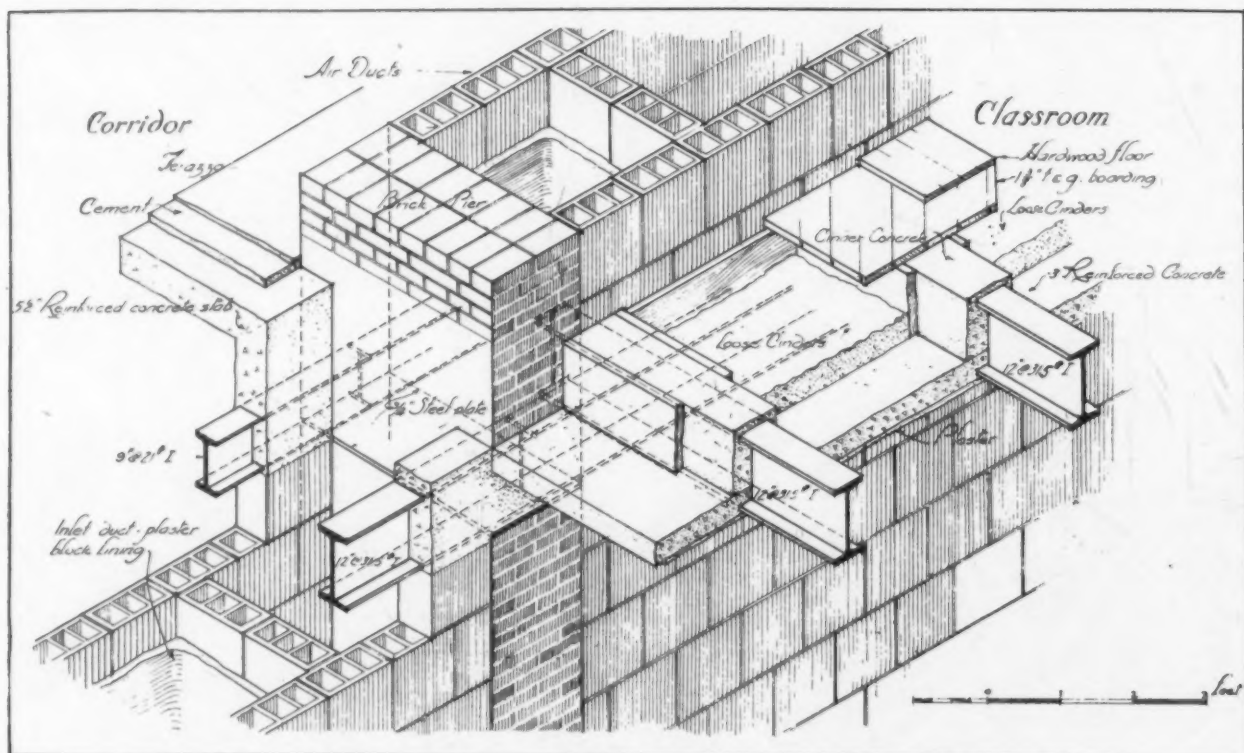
Diagram of Vent Shafts, Interior Piers and Floor Construction
